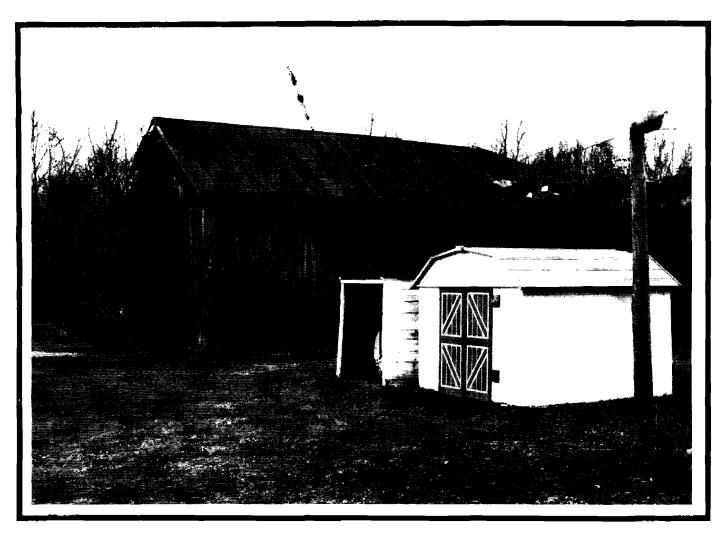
Jonathan Davis Barn (Prior to Collapse, View to Northwest
